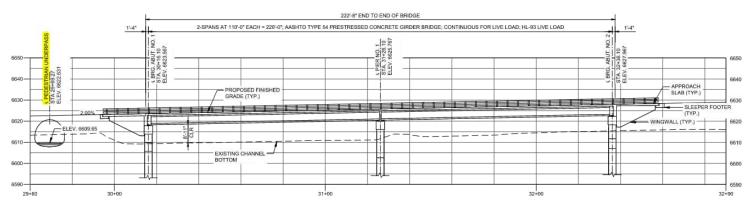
Cross Section of the Alternative 1 Pedestrian Underpass Next to the Proposed ADLC Bridge
